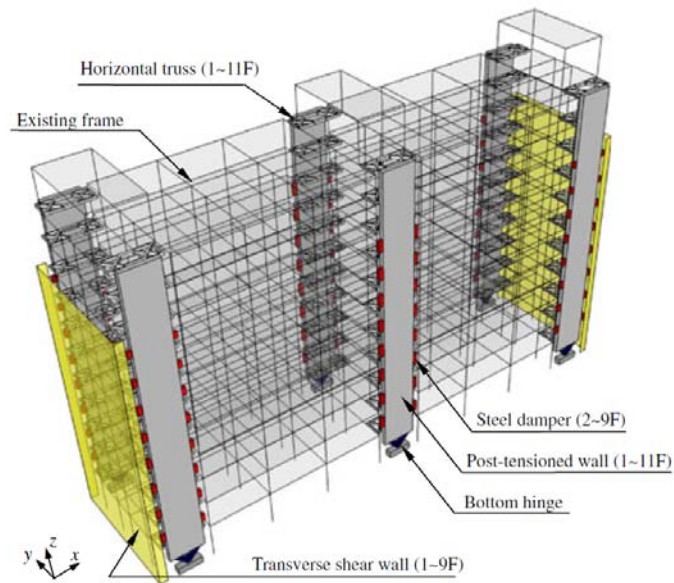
Retrofit plan of G3 building by post-tensioned wall with shear dampers ^[1.15]
